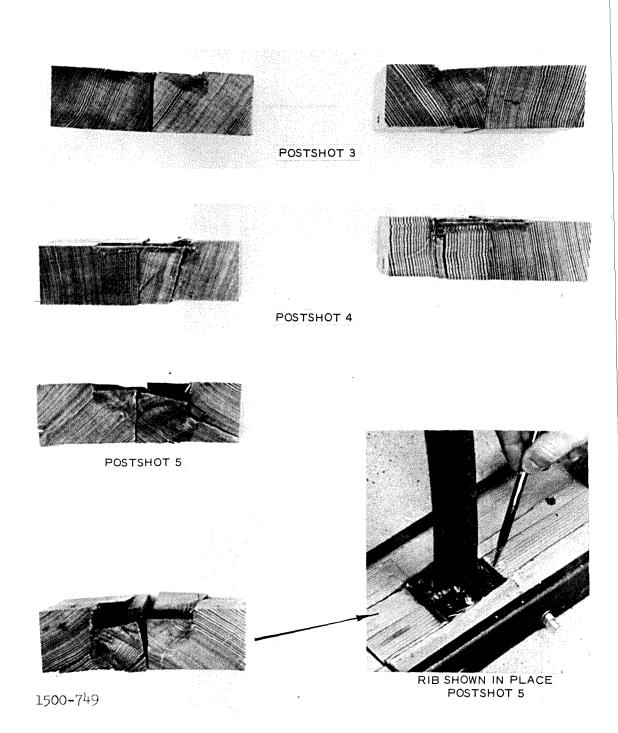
Section views of the damage shown in Figure 3.7 to the footing<sup>s</sup> at the section shown (Section AA).
